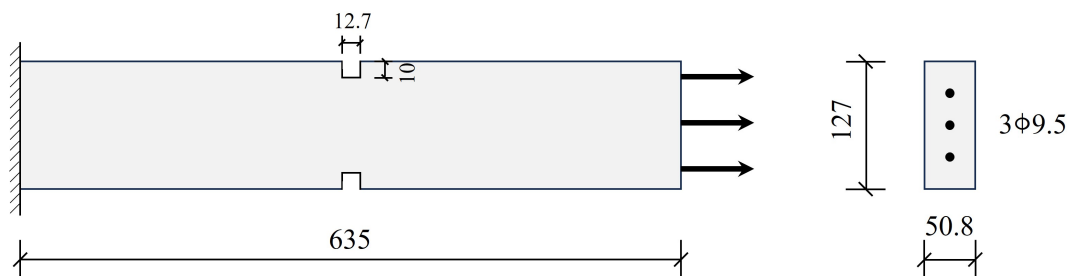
Load layout and geometry of notched RC beams under direct tension (Unit: mm)
